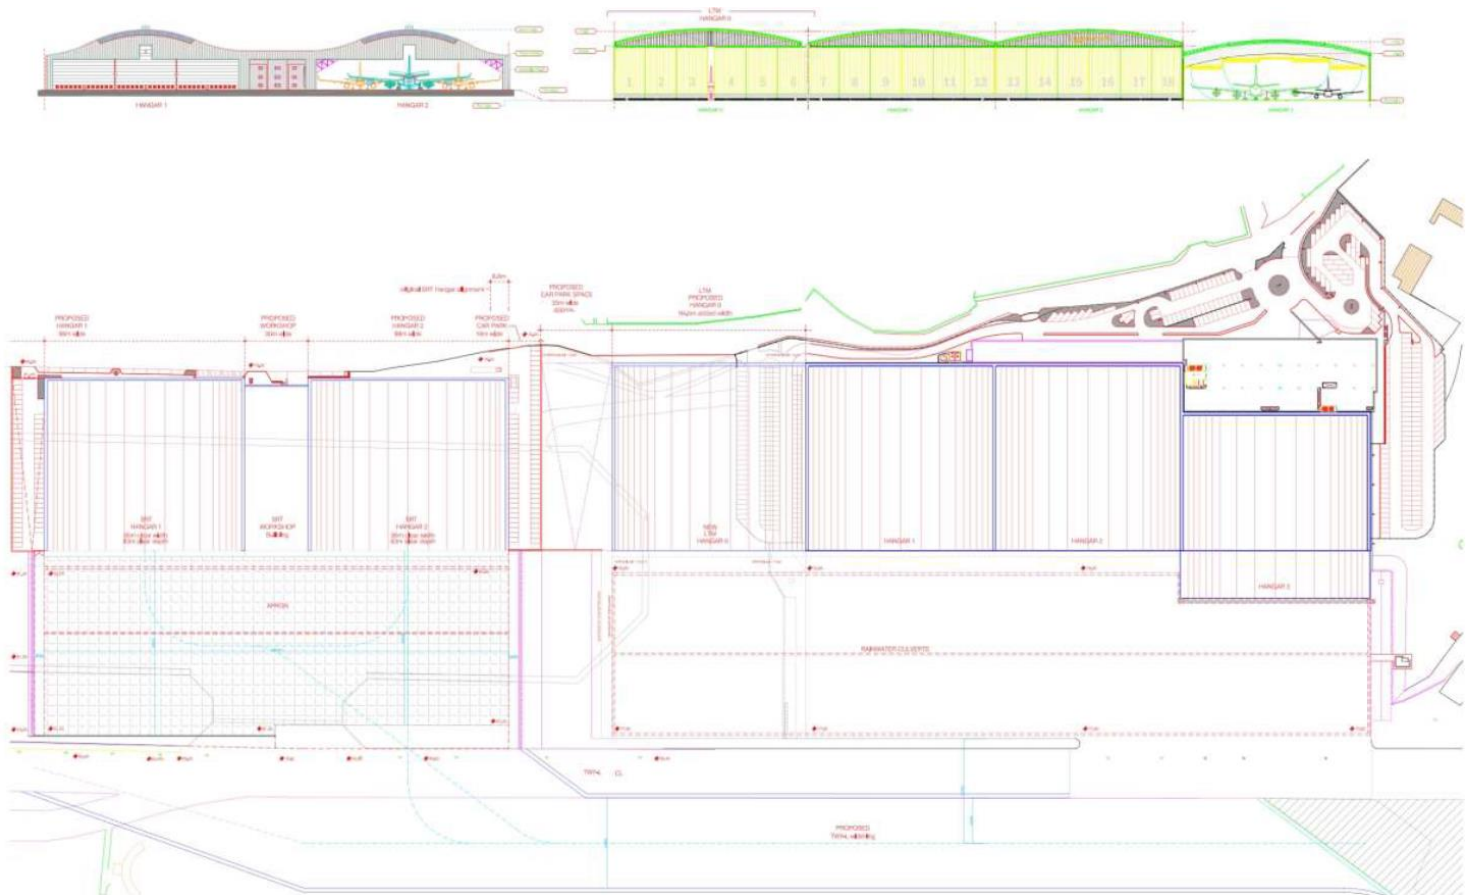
Proposed block plan showing existing LTM Hangars 1, 2 & 3 to the right and approved SR Technics Hangars 1 & 2 to the left (Source: PDS).
